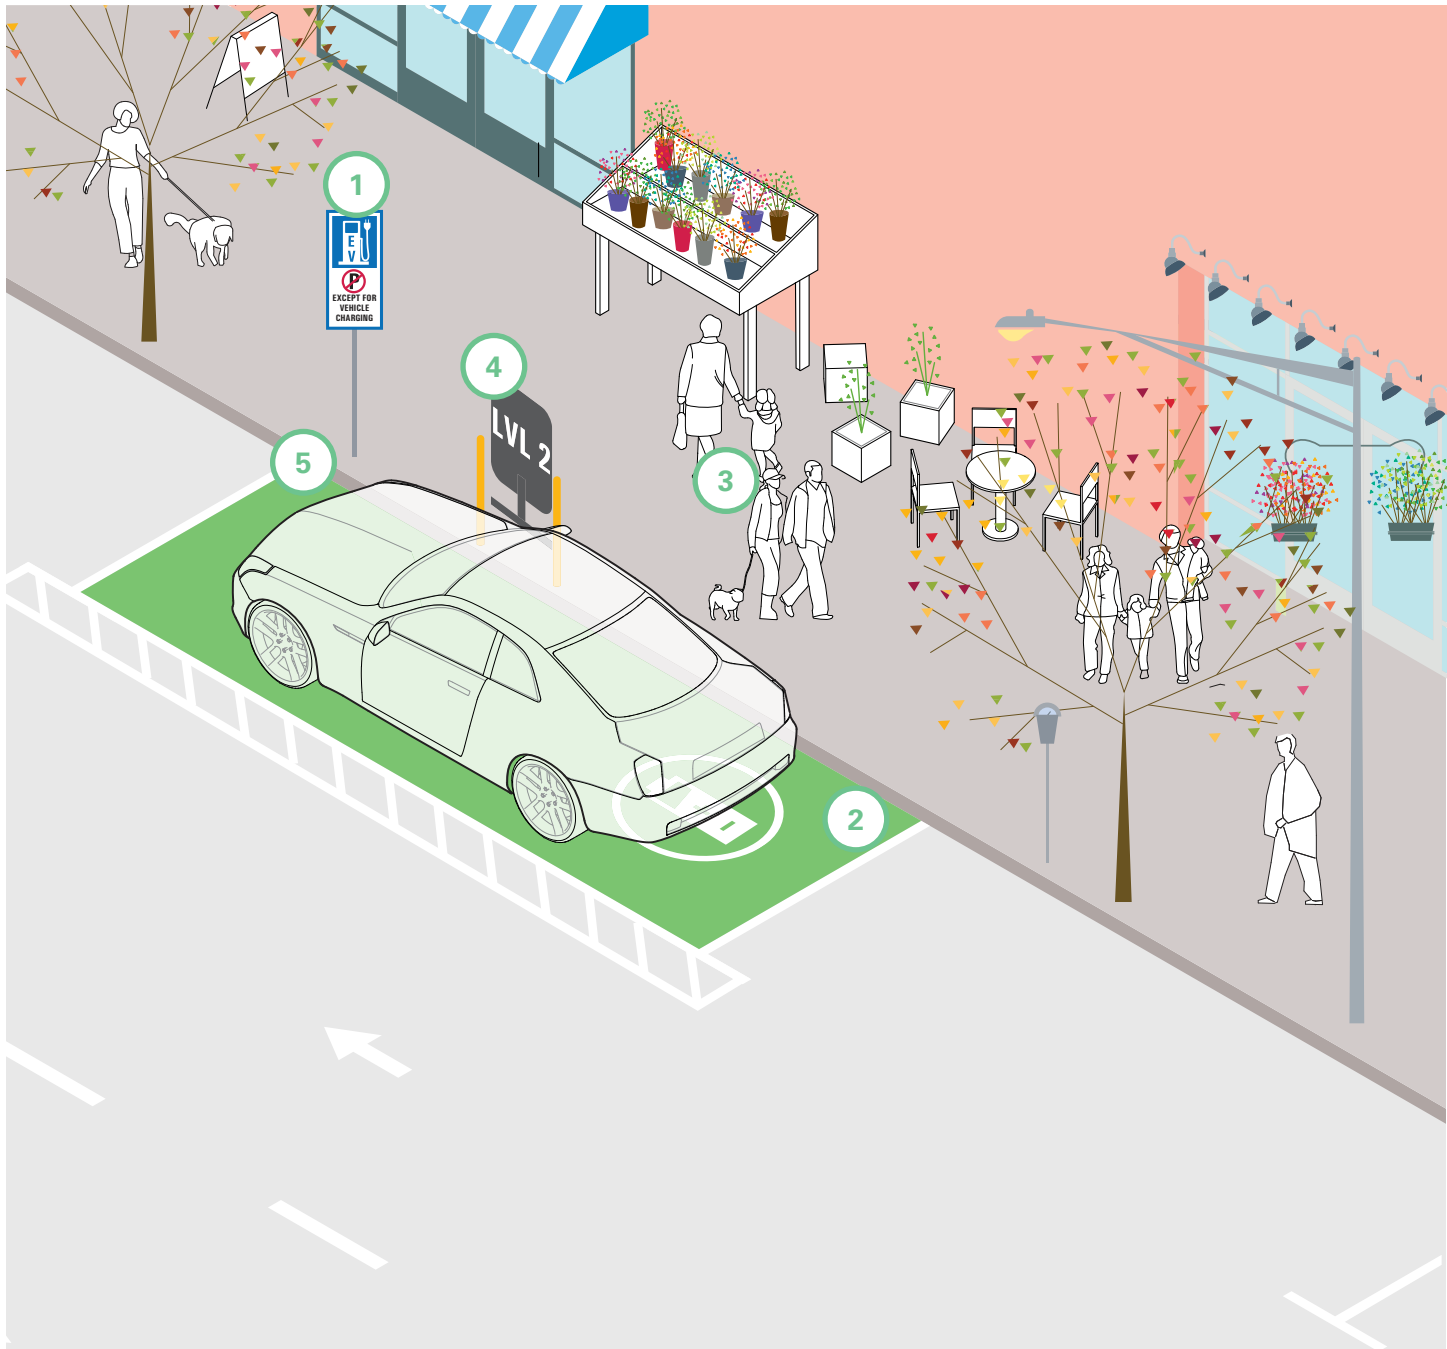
SITING AND DESIGN GUIDELINES FOR ON-STREET PARKING
